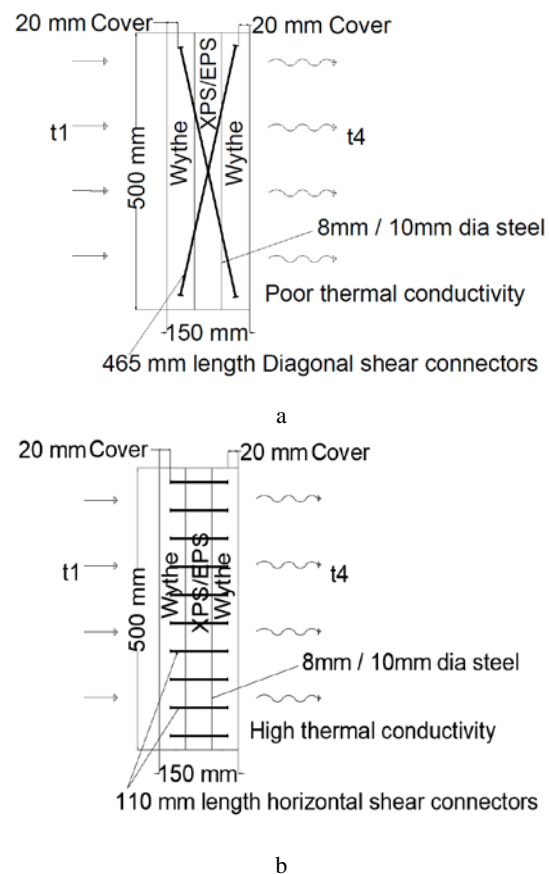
Arrangement of shear connectors: a – diagonal shear connectors arrangement; b – horizontal shear connectors arrangement
